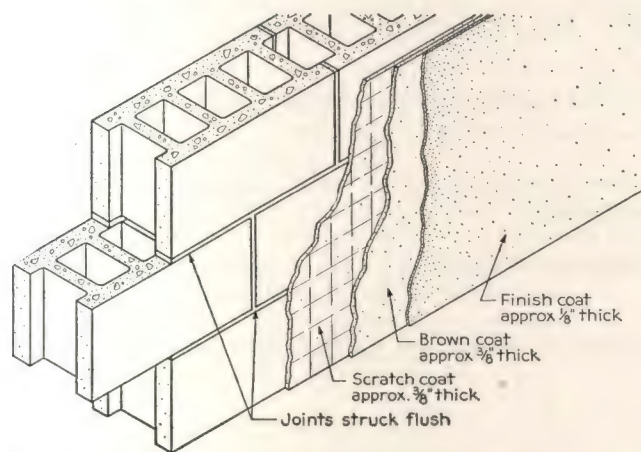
Application of portland cement stucco to concrete masonry walls. Similar construction is used for portland cement plaster.
